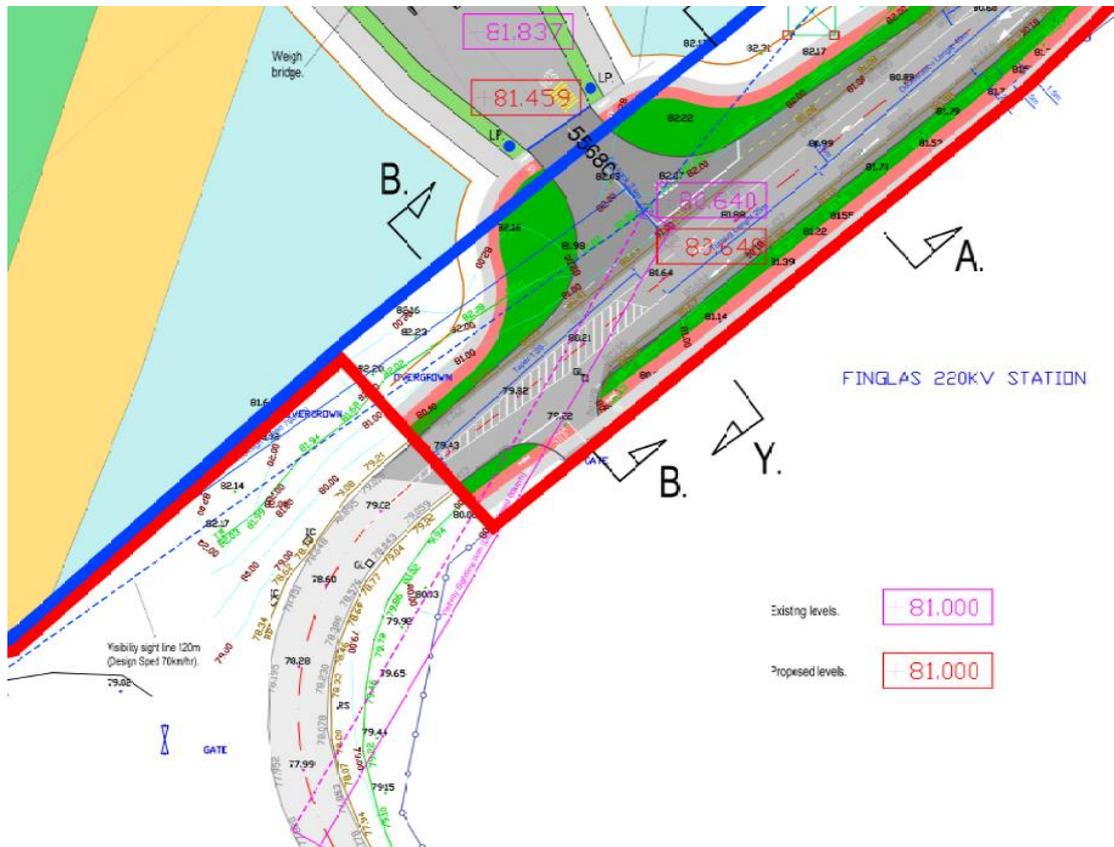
Extract from site layout plan with sight splay crossing over verge and ESB splay
